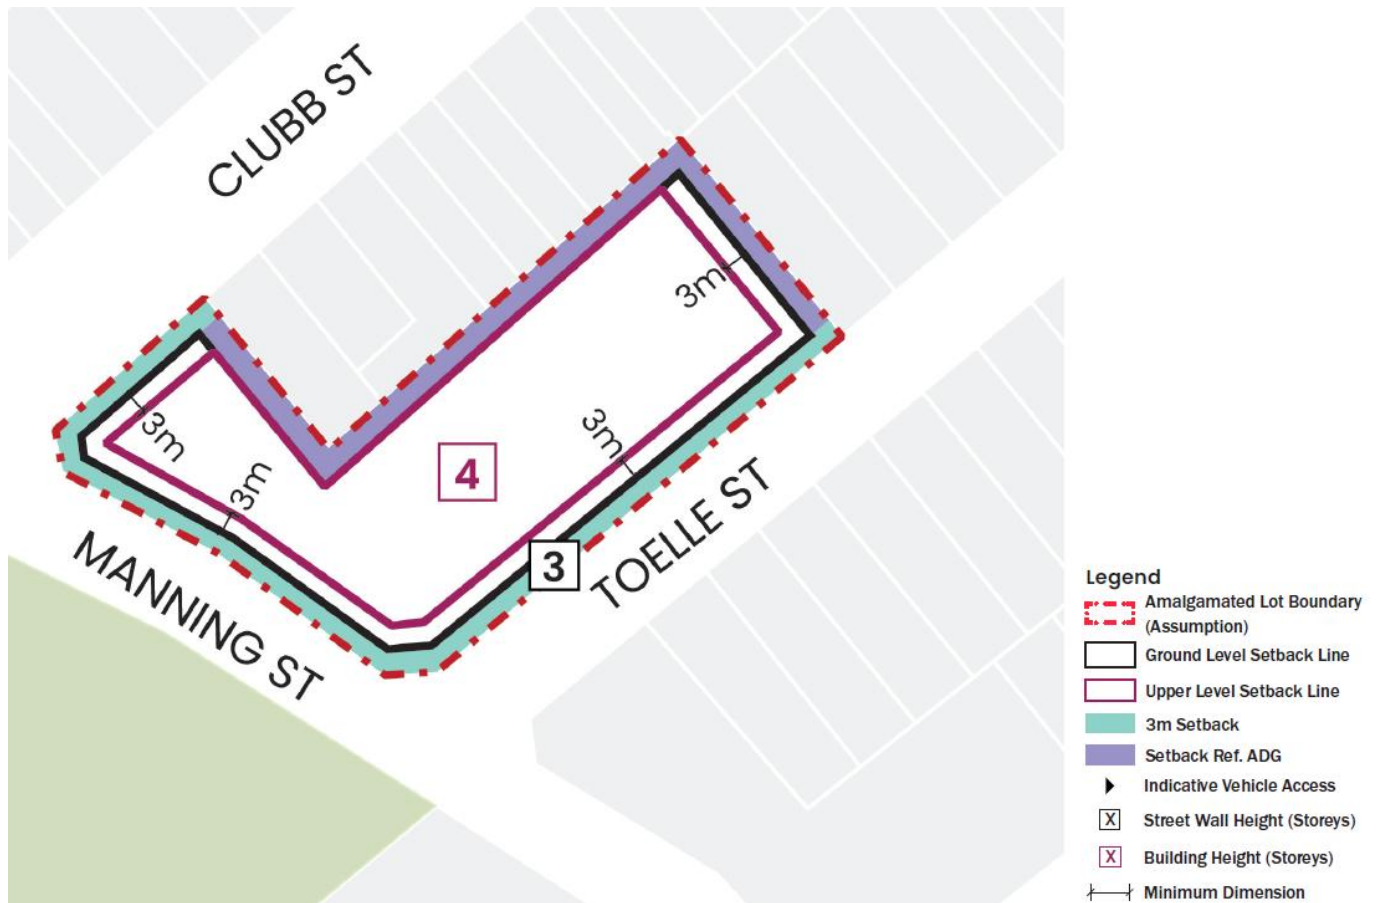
19-33 Toelle Street and 31-33 Manning Street - Indicative Layout and Design Principles
